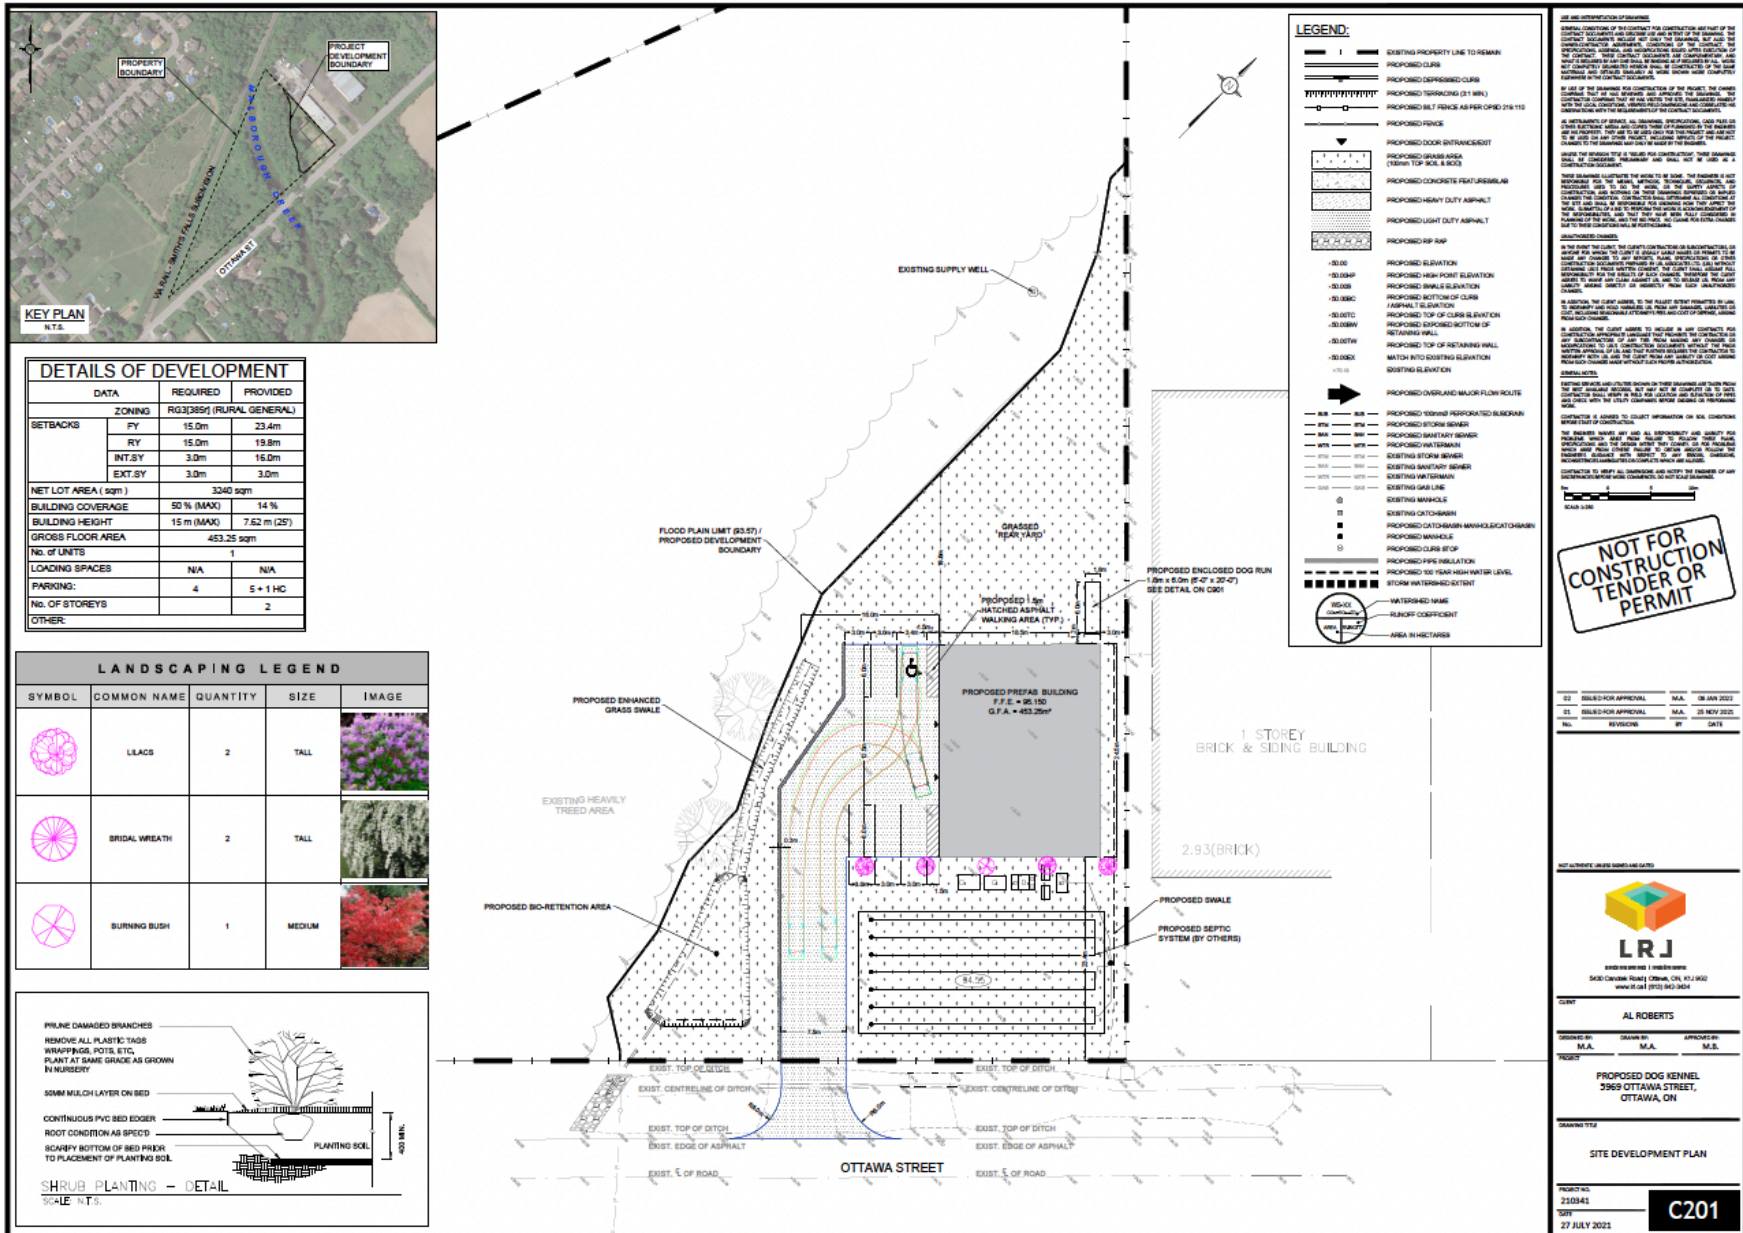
Proposed site plan and landscape plan prepared by LRL Associates Ltd.
